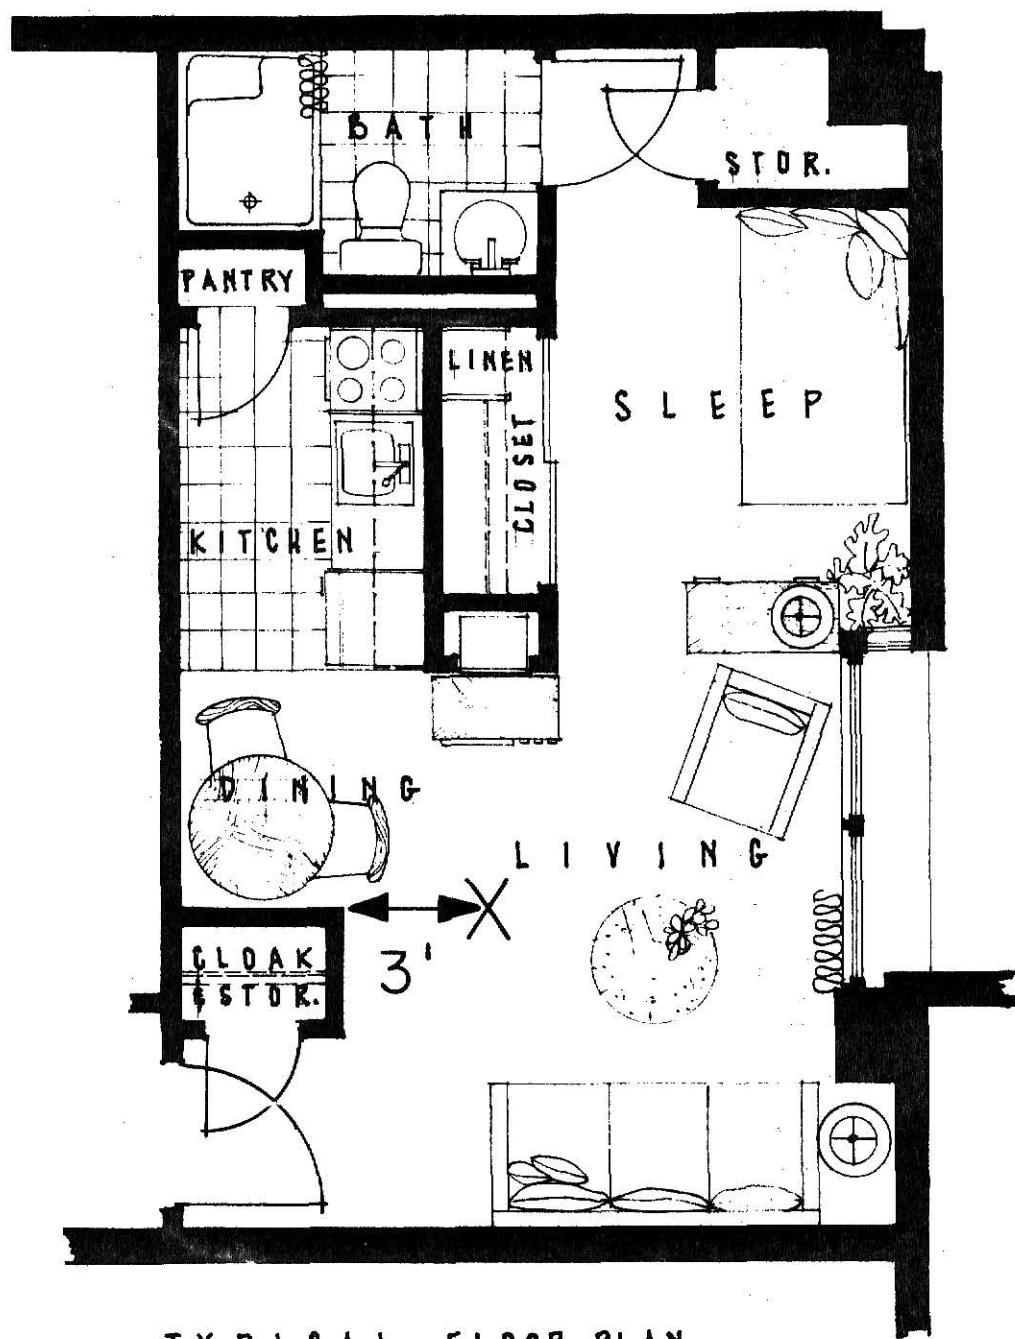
Schematic Floor Plan -- Living Units, Floors 2-12
